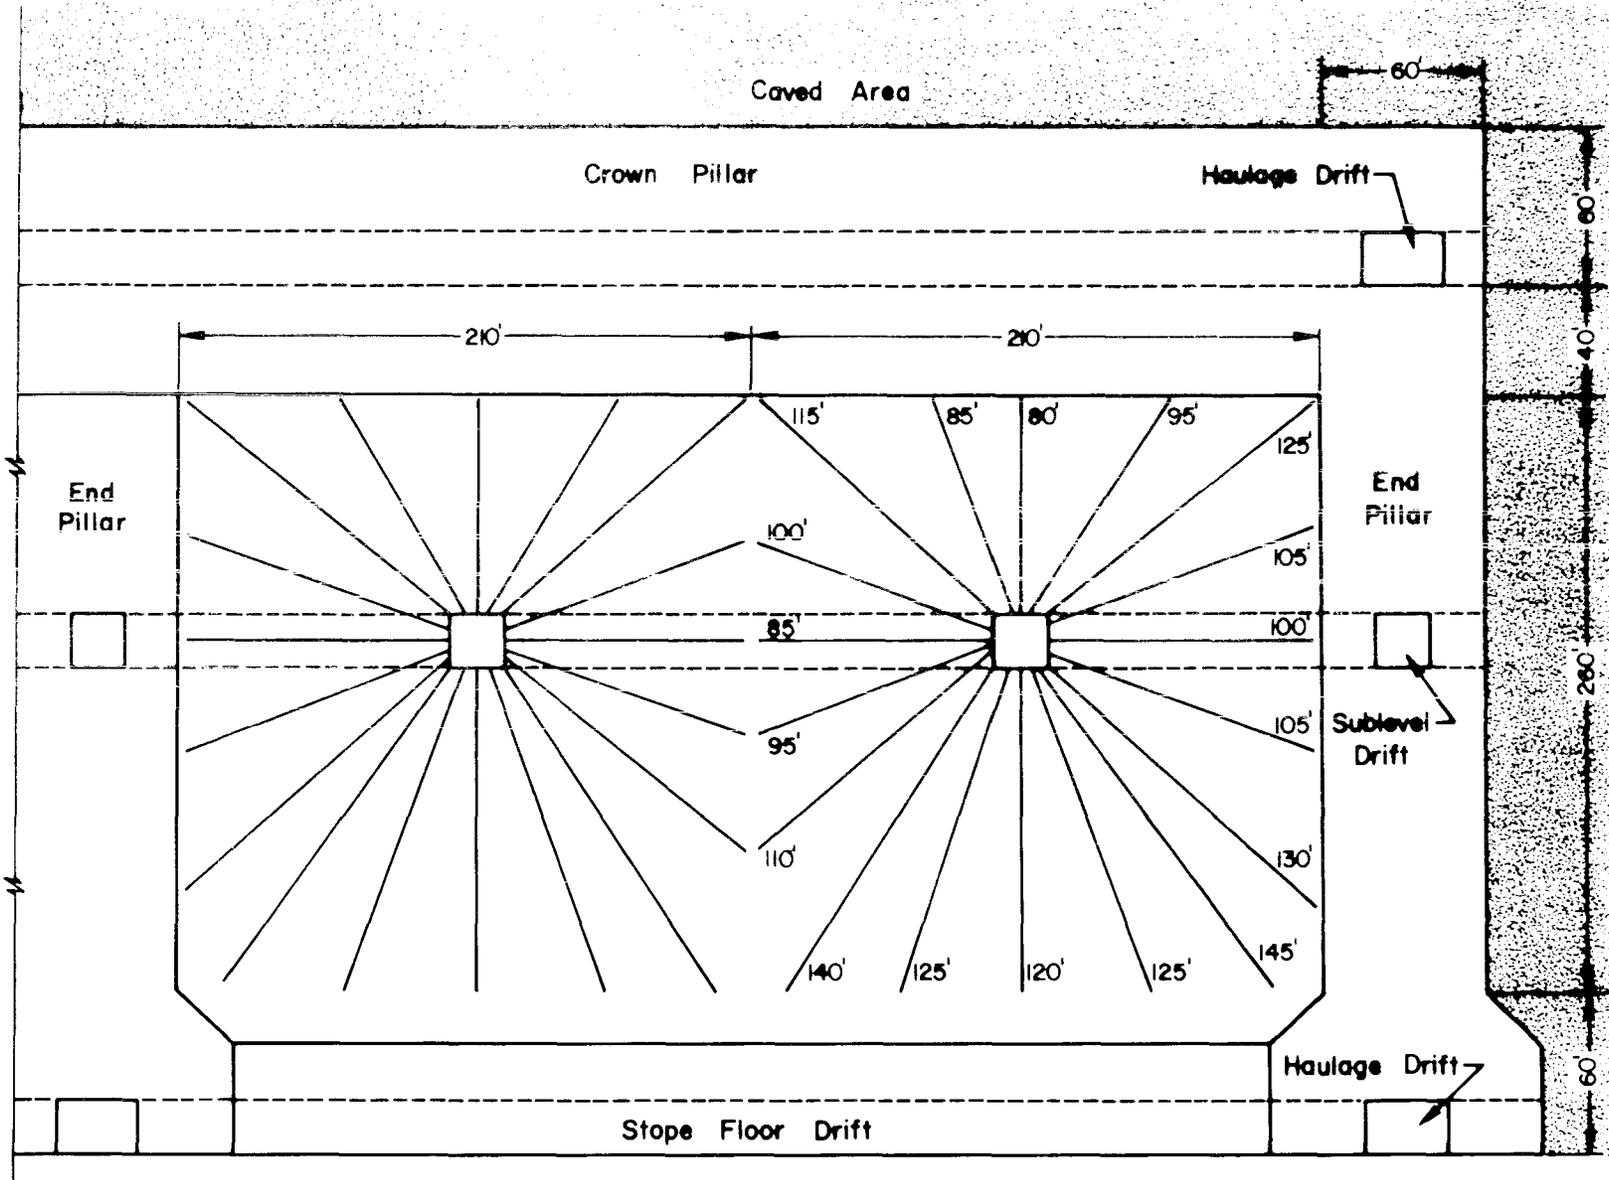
Rib Pillar Fan Drill Design for Sublevel Stopping with Full Subsidence
